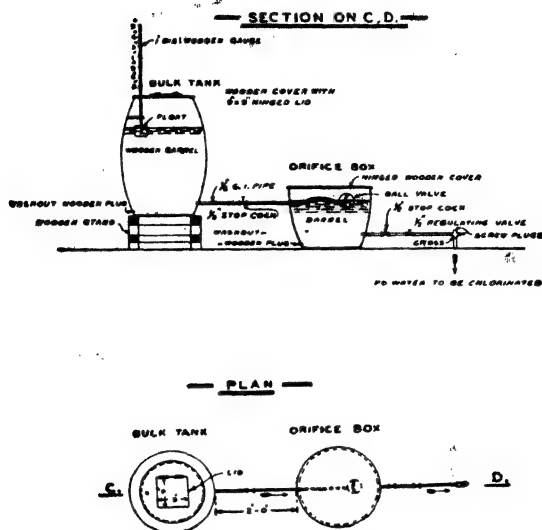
Arrangement for mixing Coagulant for Chlorinating Water.
